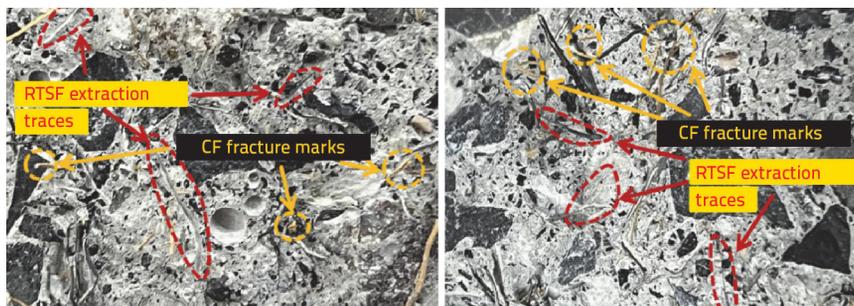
Fibre morphology of fracture surfaces of concrete beams
